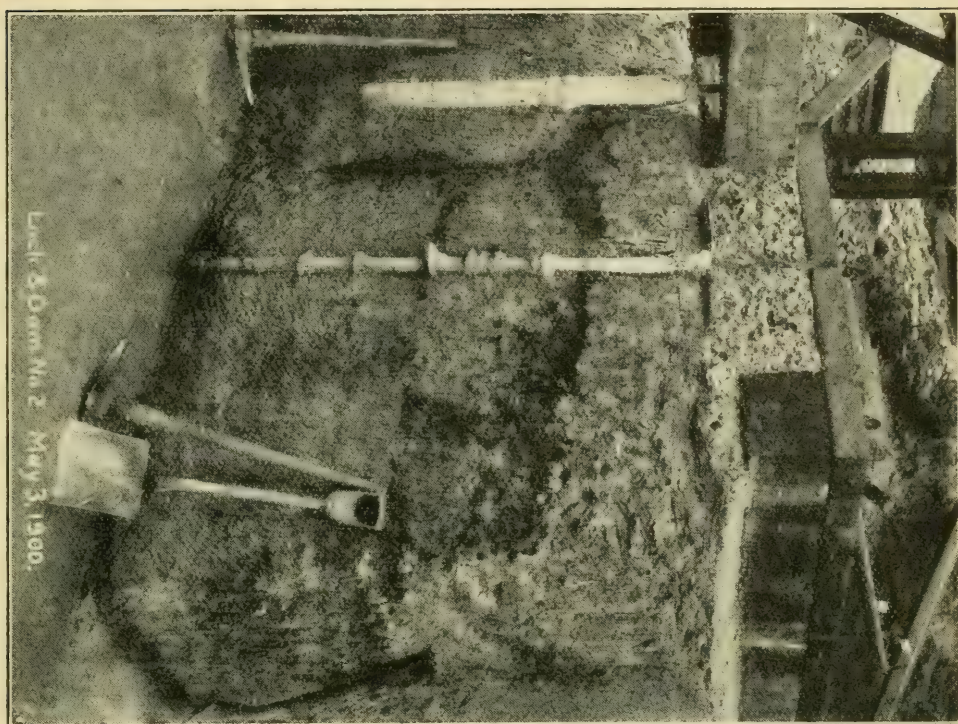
WHEN EXCAVATION HAD PROGRESSSED TO A DEPTH OF 6 FEET.
